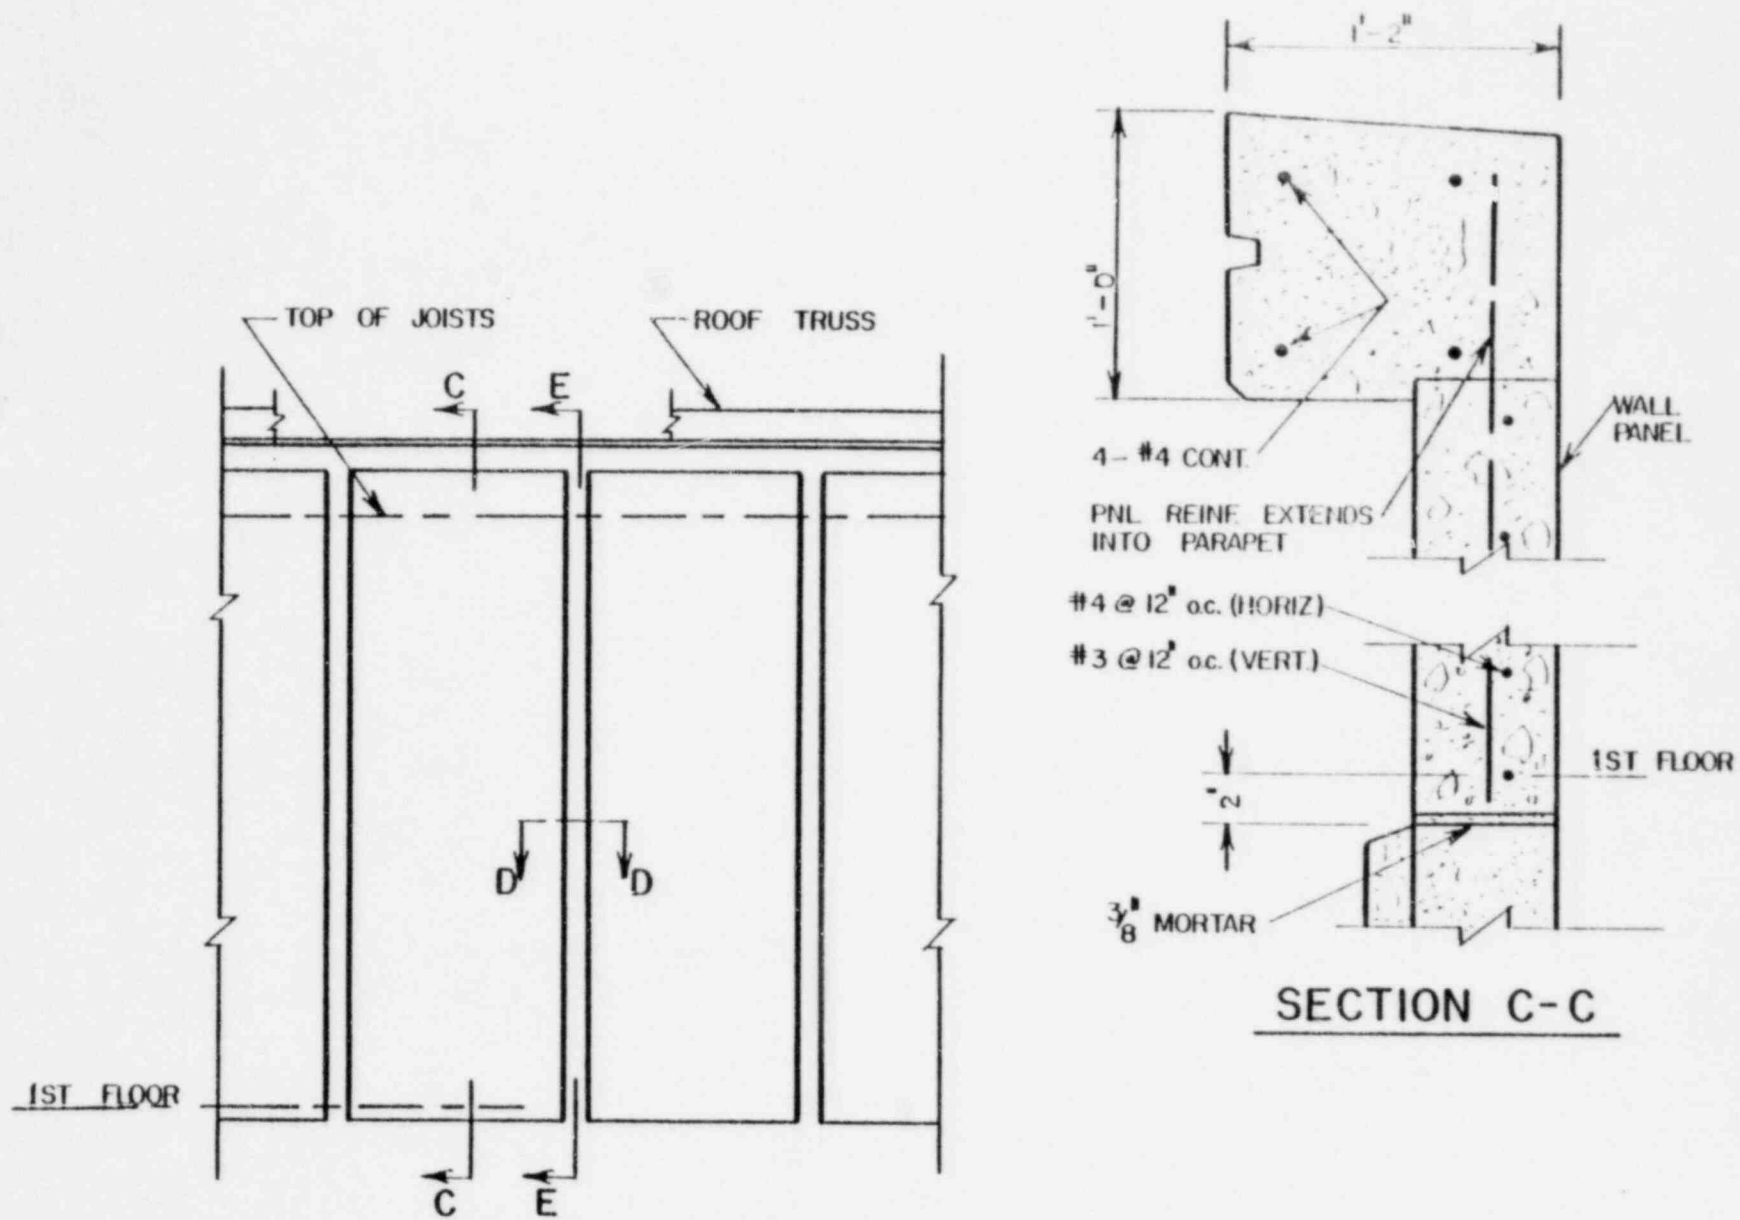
TYPICAL WALL PANEL CONSTRUCTION
